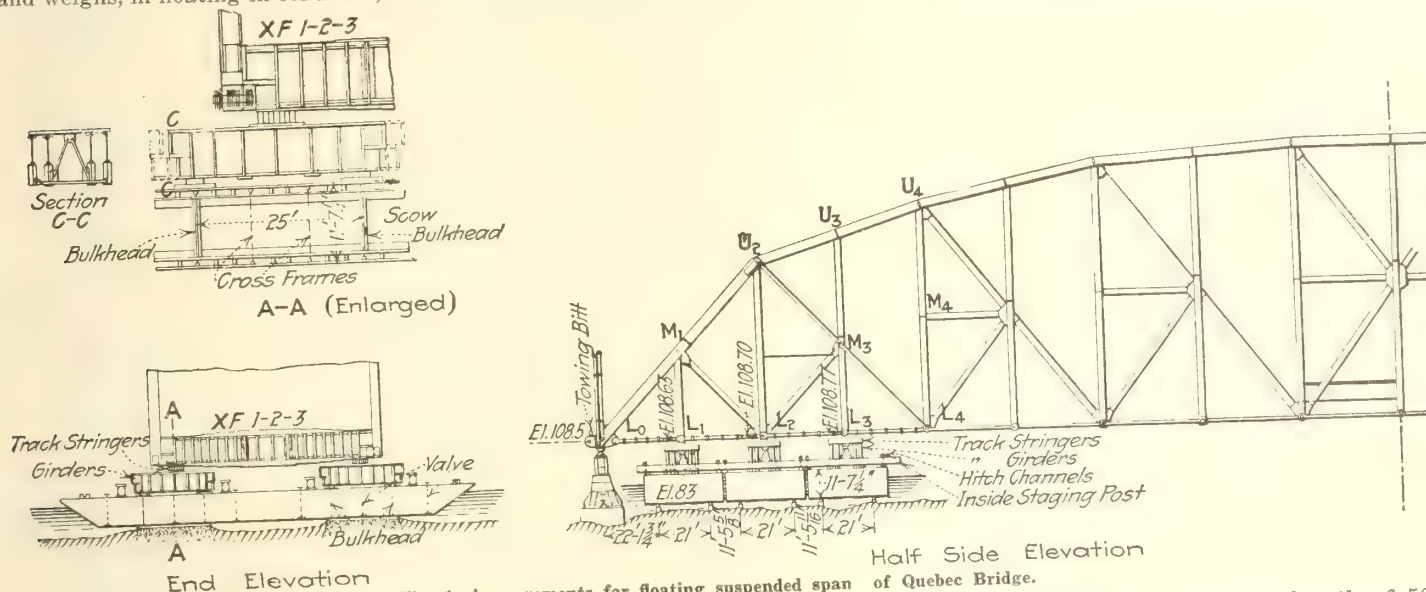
Arrangements for floating suspended span of Quebec Bridge.
